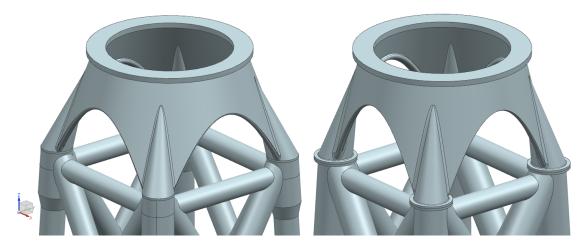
Short cone on tower section 2 (left) and section 1 (right)
